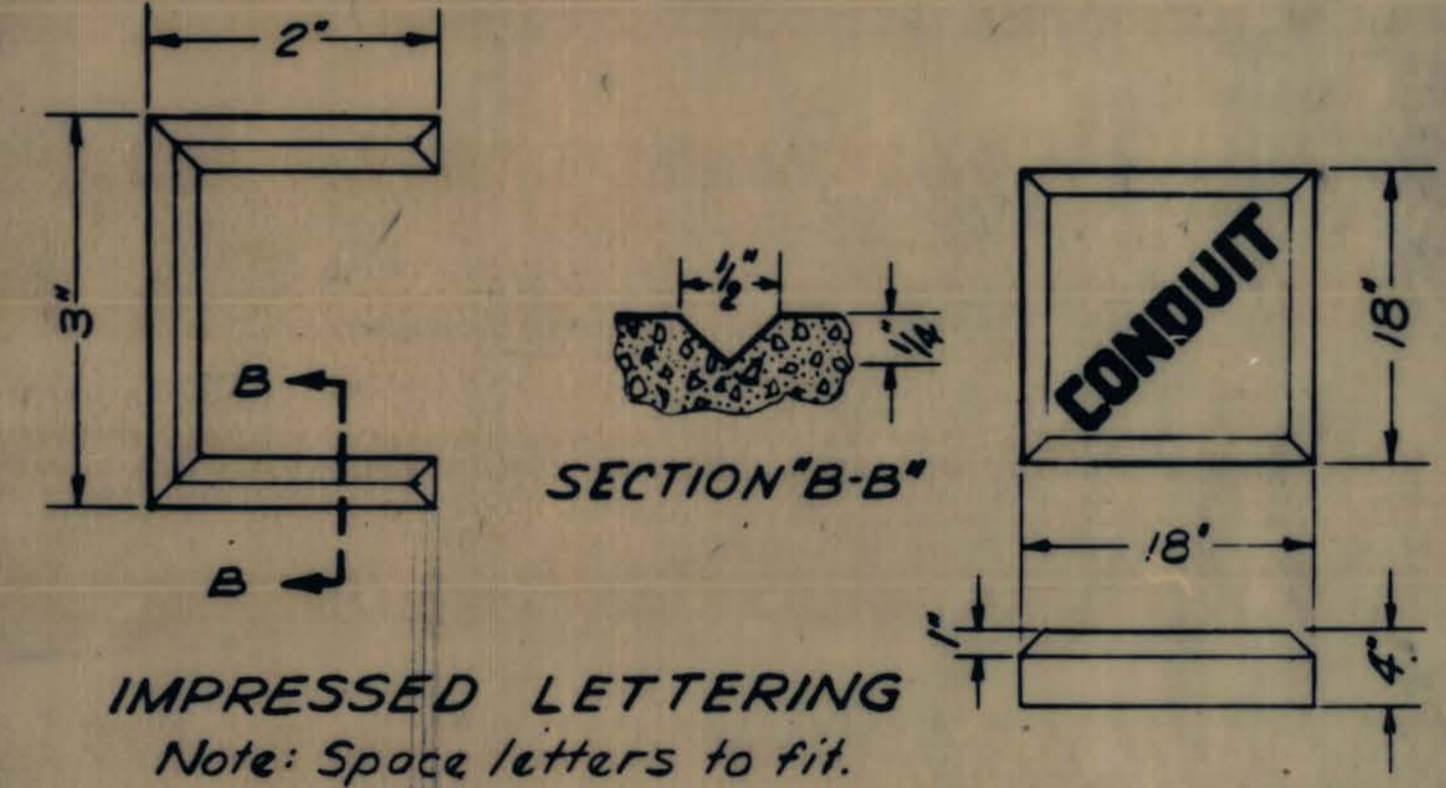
DETAIL FOR CONDUIT JACKED UNDER PAVEMENT
